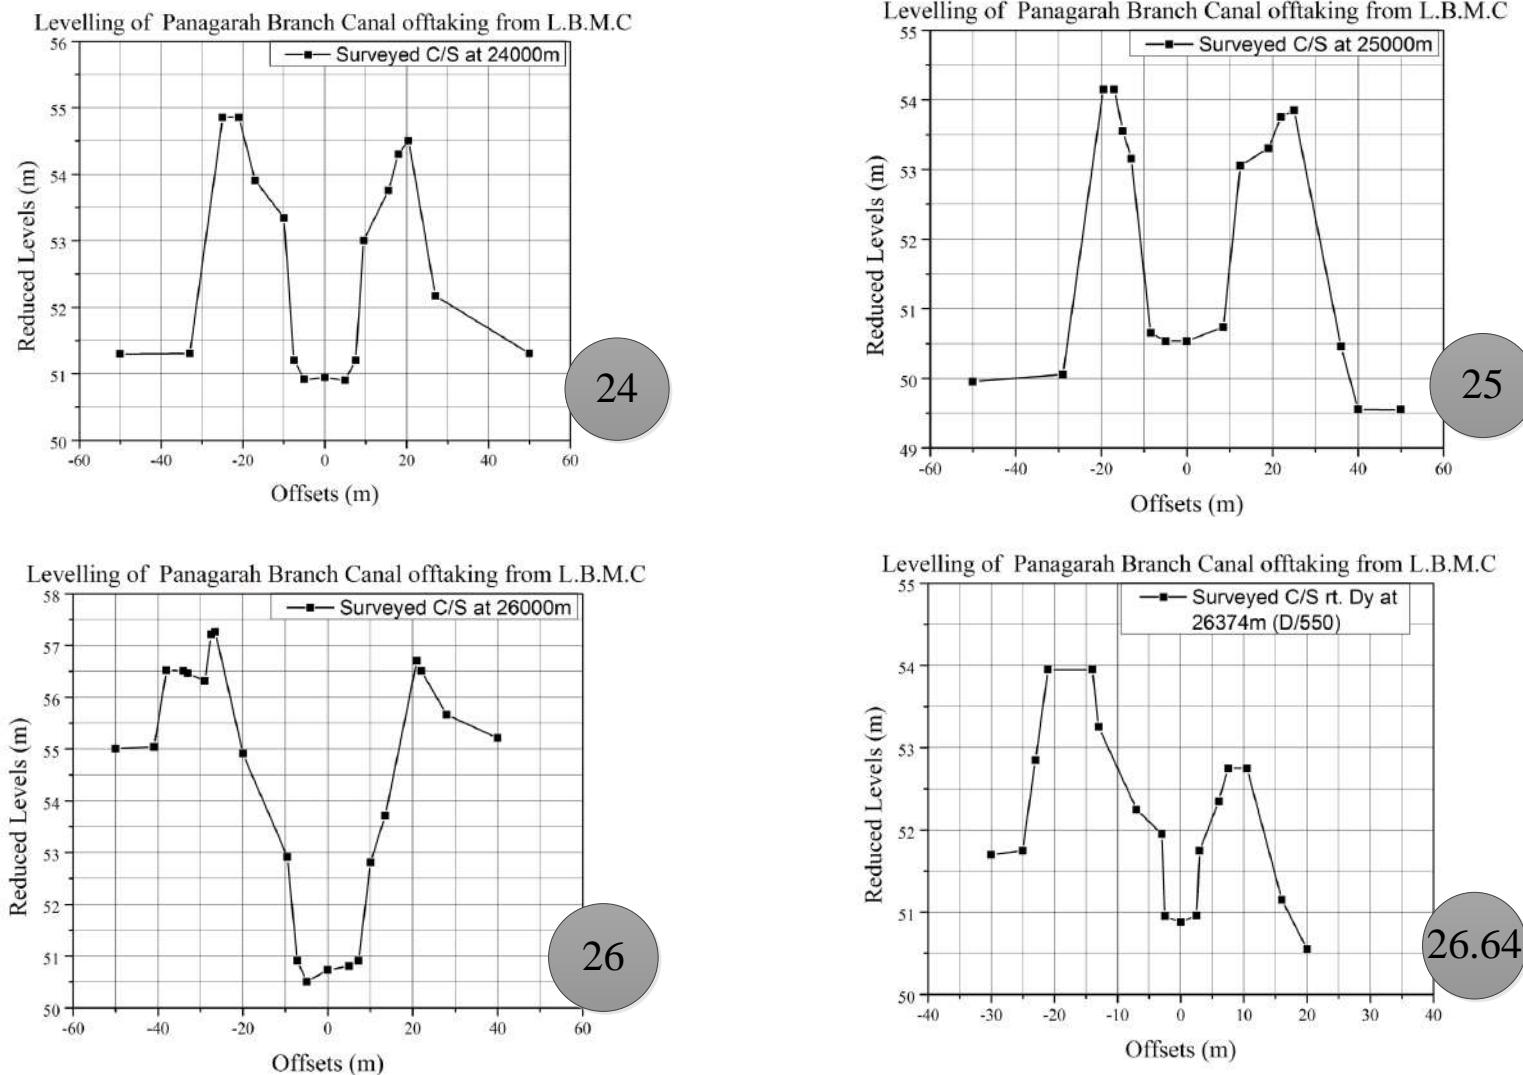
Canal cross section from 24 km to 26.64 km on Panagarah branch canal
